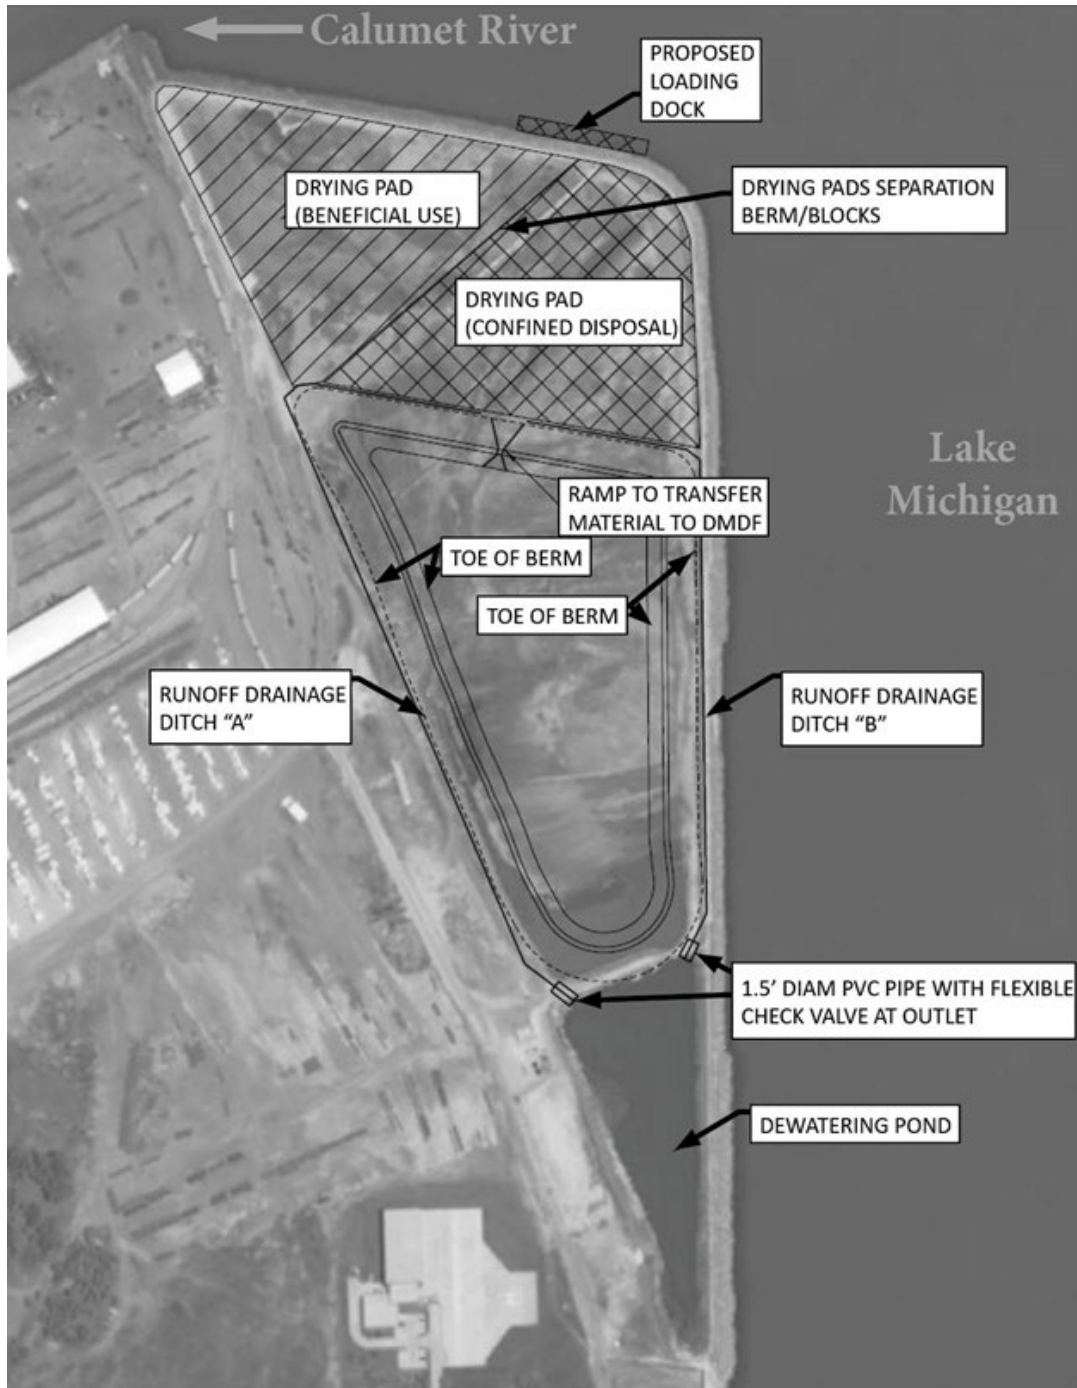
Existing Chicago Area CDF with proposed new dredged material disposal facility plan overlaid.
